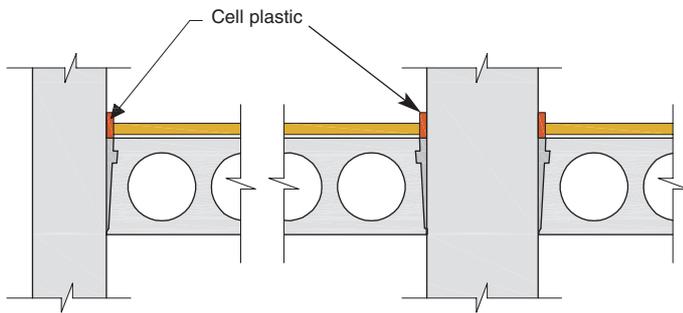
Strips of cell plastic against firm through-going constructions like beams and walls
